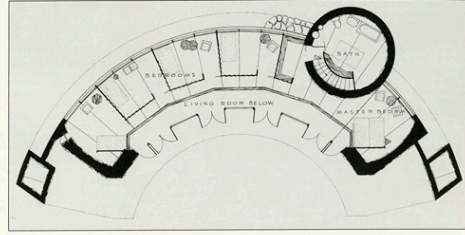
Jacobs House II, second-floor plan, final design. Minor changes were made during construction, particularly the furniture arrangement, addition of closets in the bedrooms and bath, and a door from the master bedroom. ©1988 FWWright Fdn.
